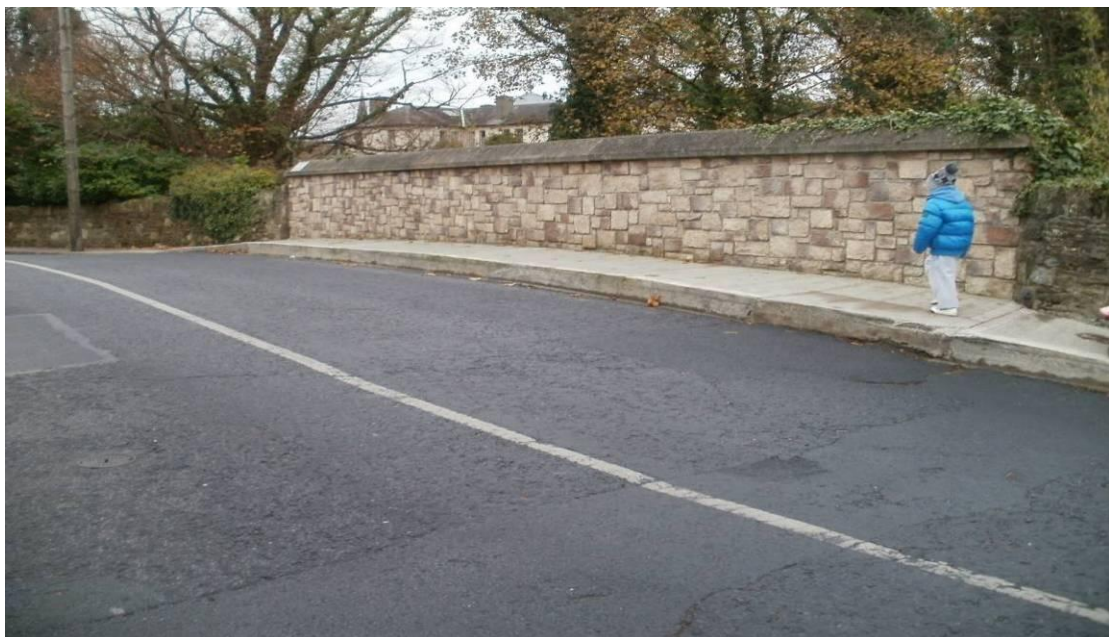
Bridge crossing OBJ 470 in Ferrybank
